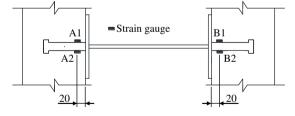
Geometry and detailing of the push-out specimens (all dimensions in mm).
